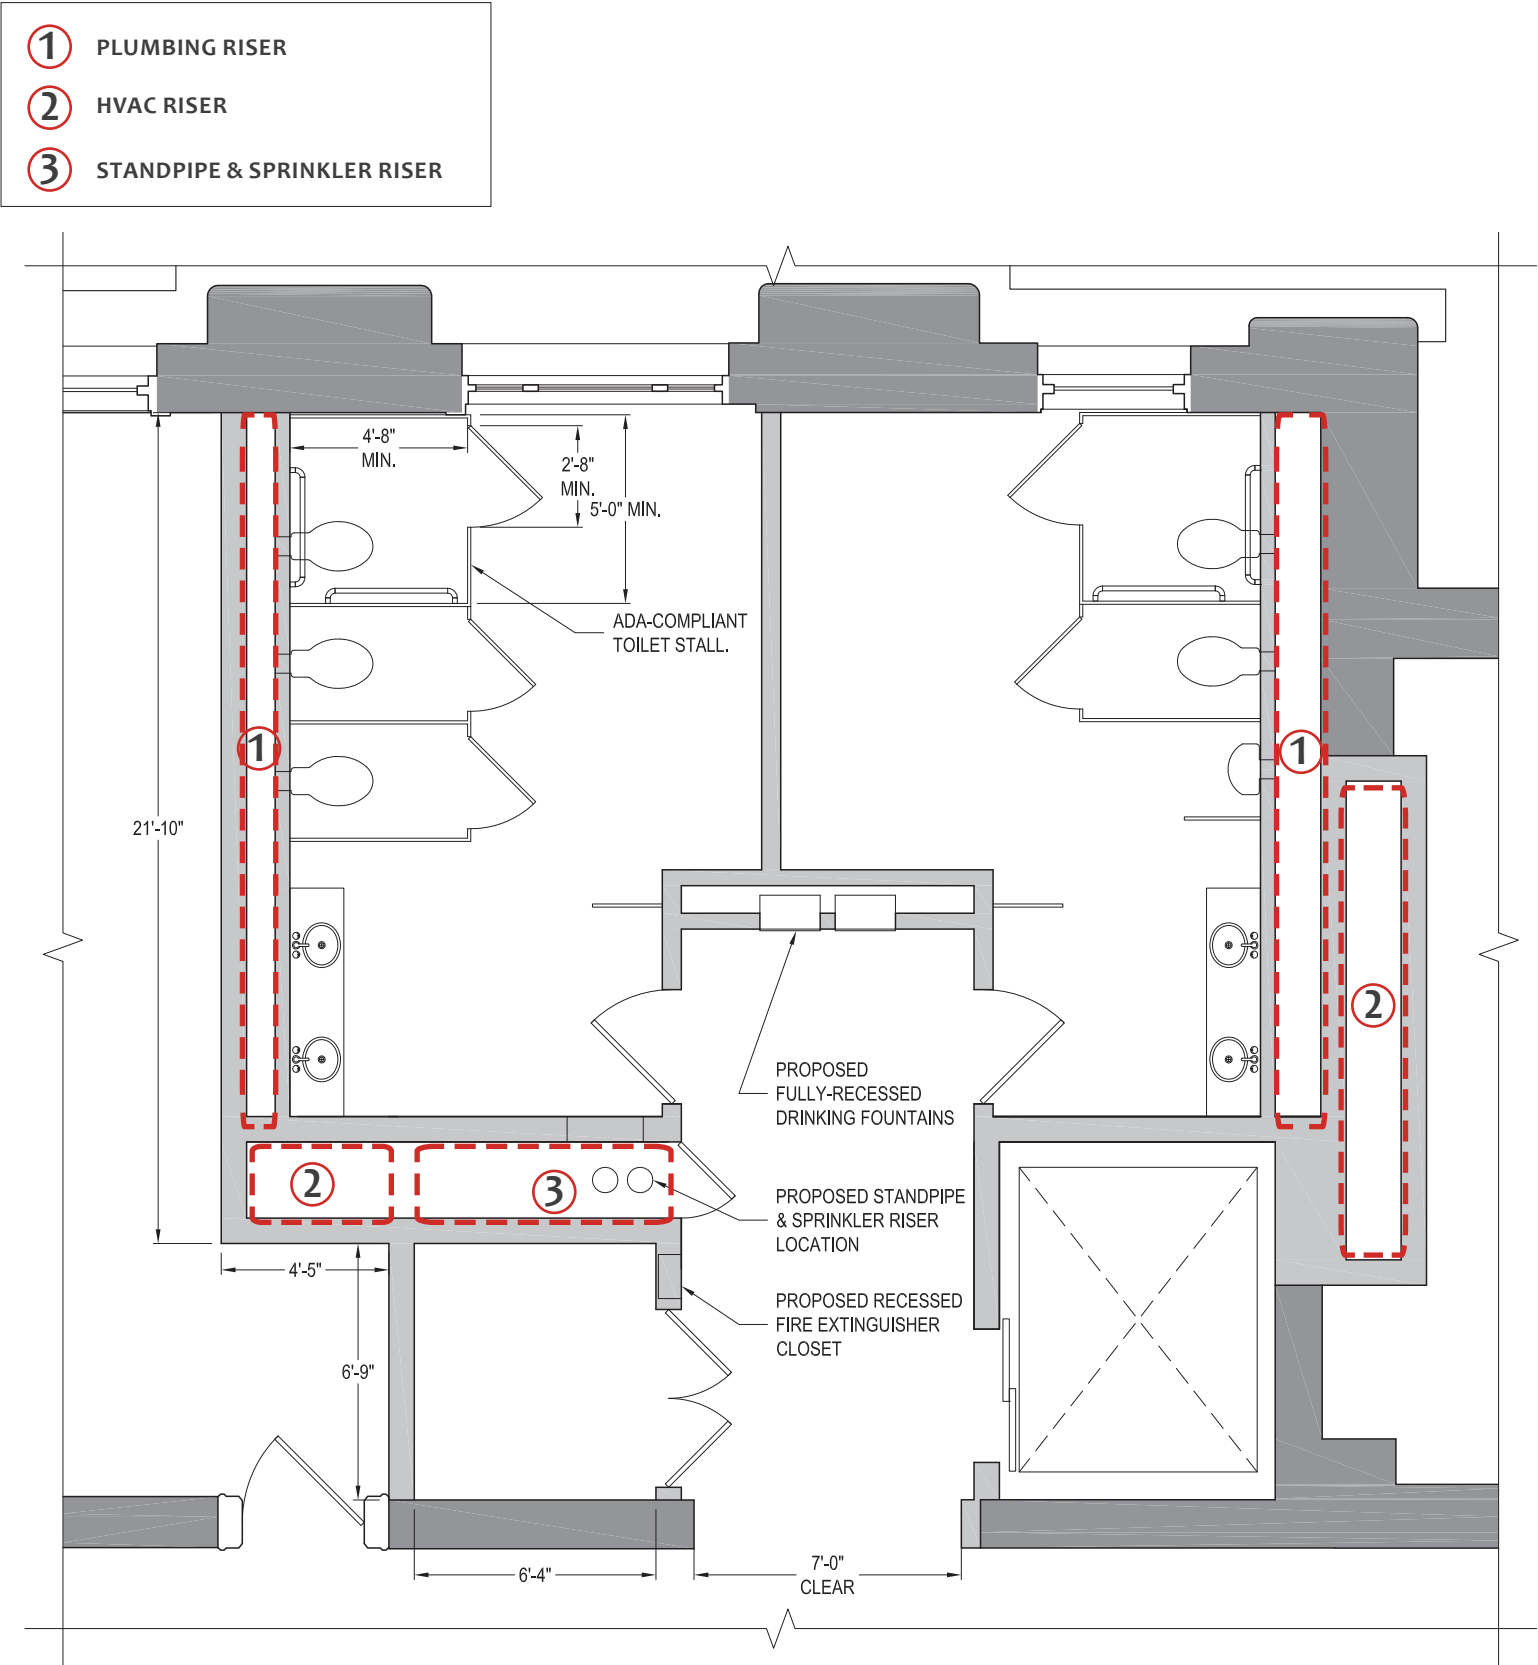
First Floor Level [West] Proposed Service Core.
